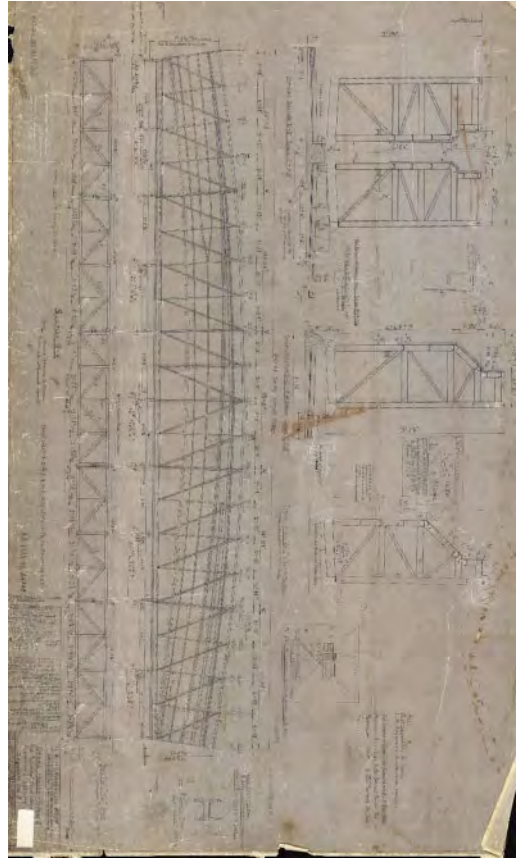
M.R. Hornbrook, Rib Segment Formwork, Section, Frames, Detail, Segments from 1 to 5. NSW Archive and Records. NRS:64328 – 73-20 (revision F).
